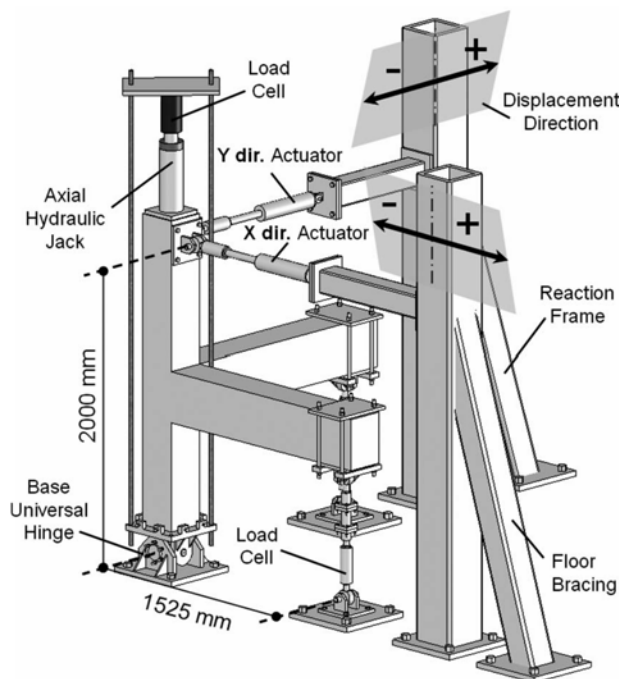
Test setup for the 3D tests on corner beam-column joints. (Akguzel and Pampanin, 2010).
